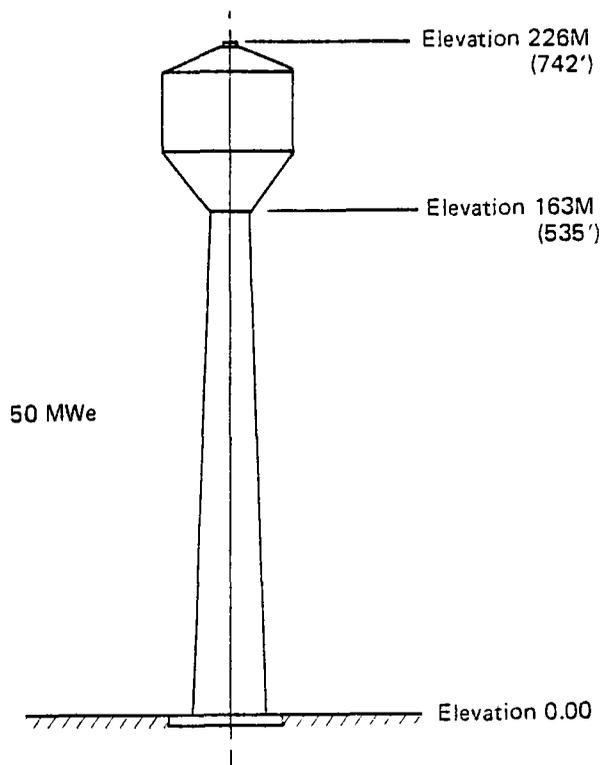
Receiver Tower Geometry - 50 MW_E Critical Module
